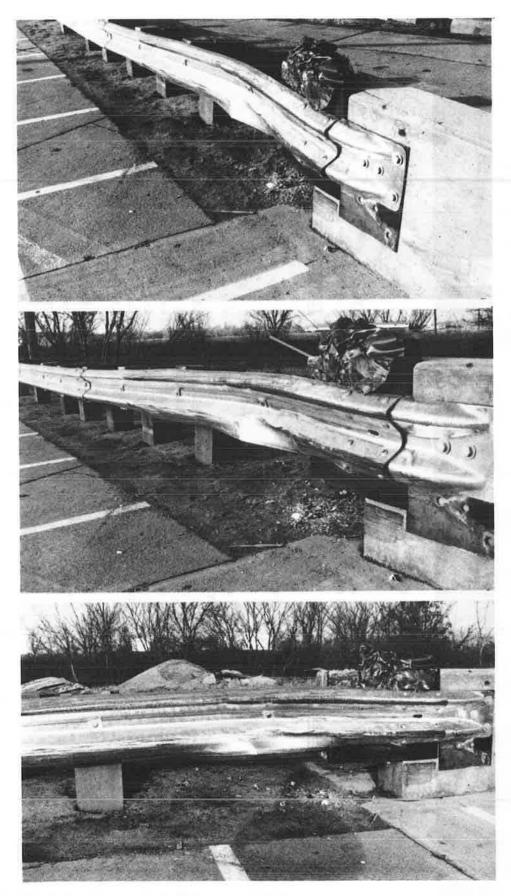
Photographs of test No. 5 guardrail damage.
